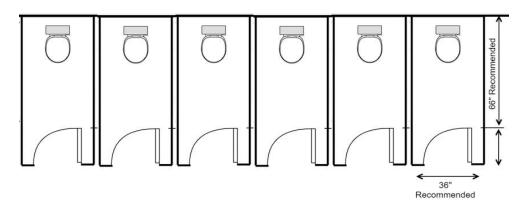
Floor Plan of the Centralized Toilet Room with Six Cubicles
